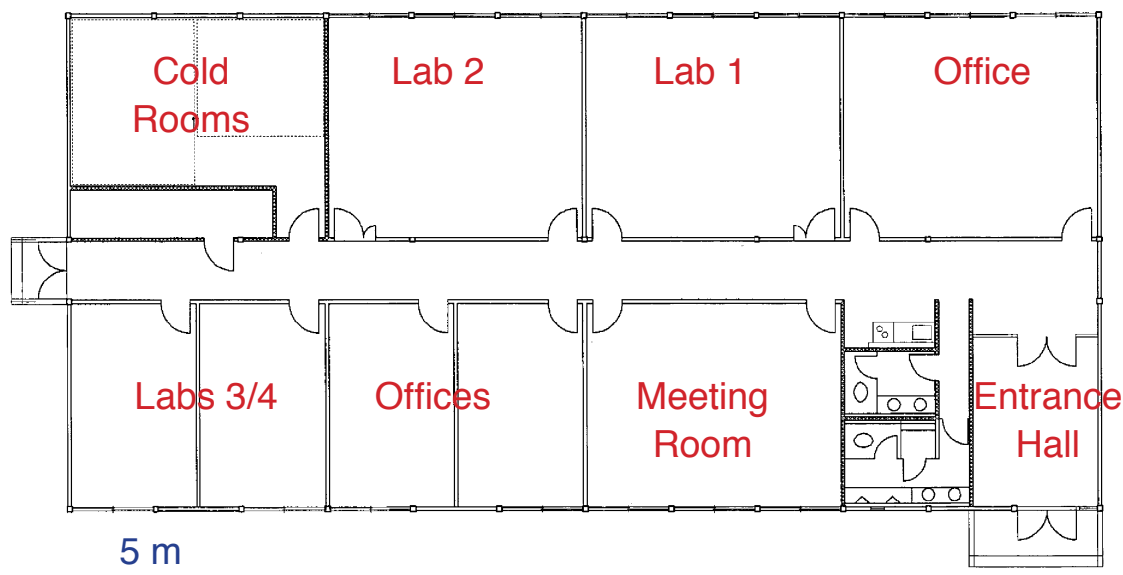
Layout of the new Structural Biology Building. Location of the building can be found in the campus map of p.123.
